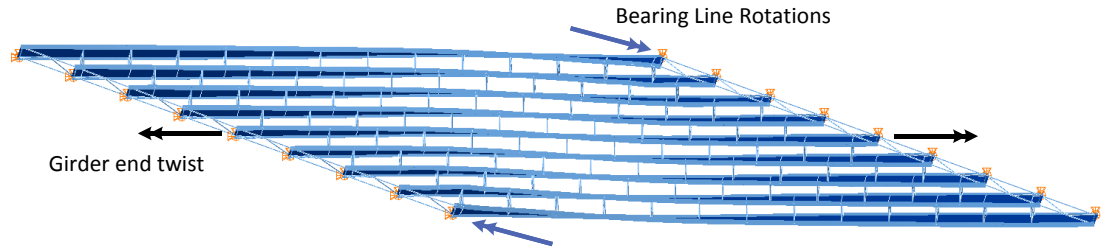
Twist of the bridge cross-section due to skewed bearing lines.
